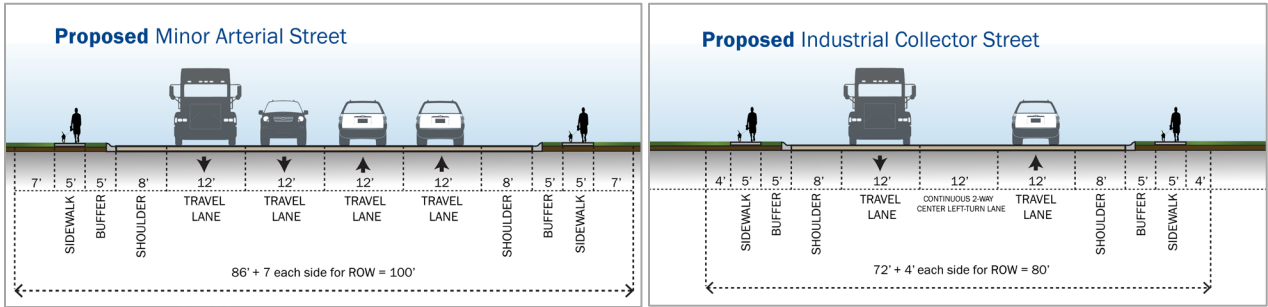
Proposed Typical Cross Sections for New Industrial Park Roads
